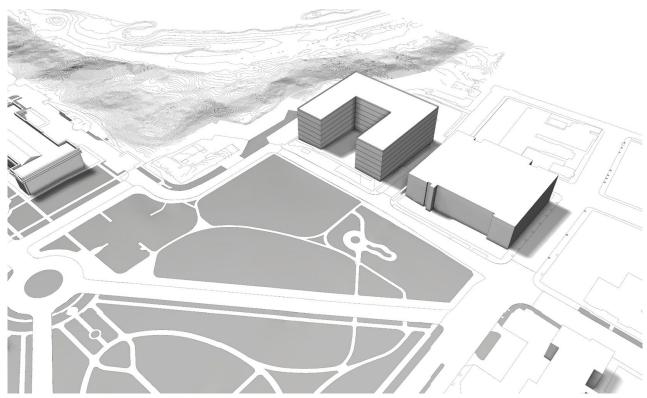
ALTERNATIVE 1.D - REPLACE GA BUILDING WITH MULTI-TENANT OFFICE BUILDING
